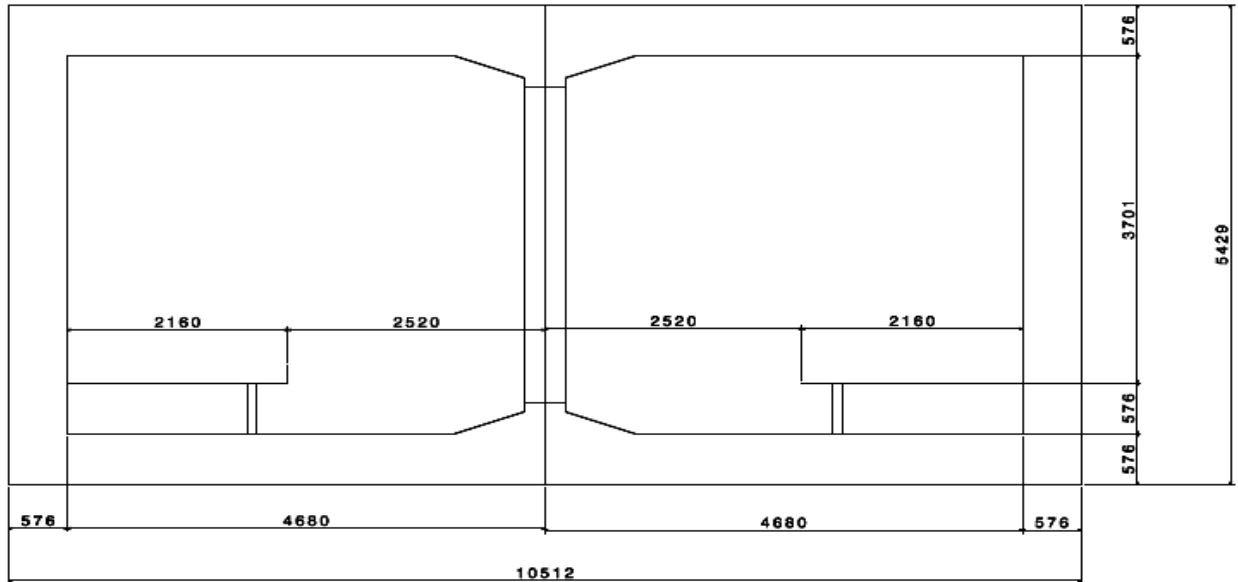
structural shape of open-cut station (Underground one-story side platform station) [30]
